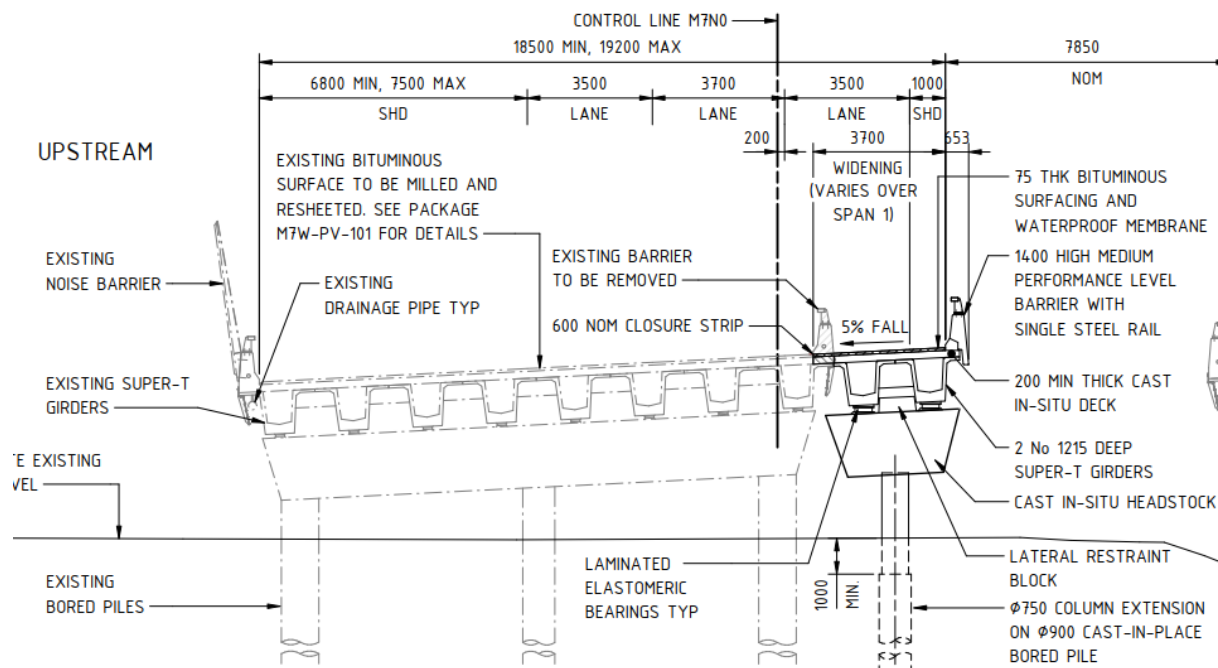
Typical bridge widening section over Piers- Super-T Bridges
